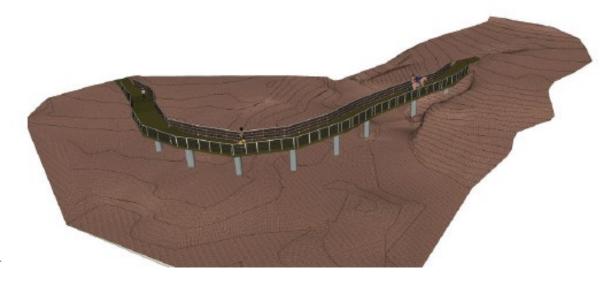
Proposed elevated boardwalk crossing over Steele Canyon Creek, looking east (upstream) without trees.
